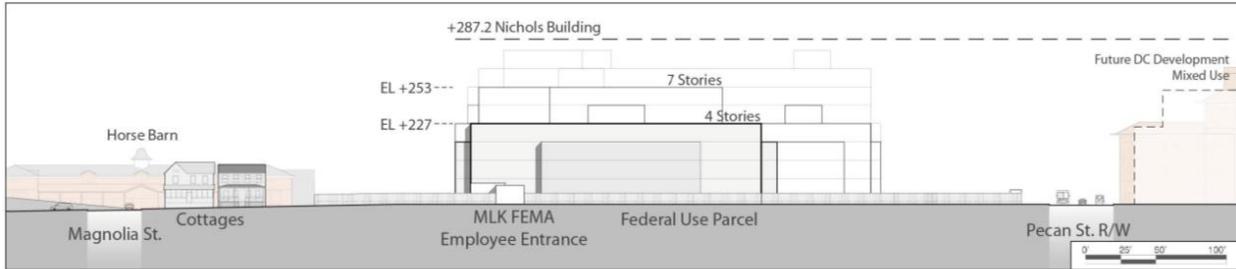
Elevation Study 2 – View East Along MLK Avenue
